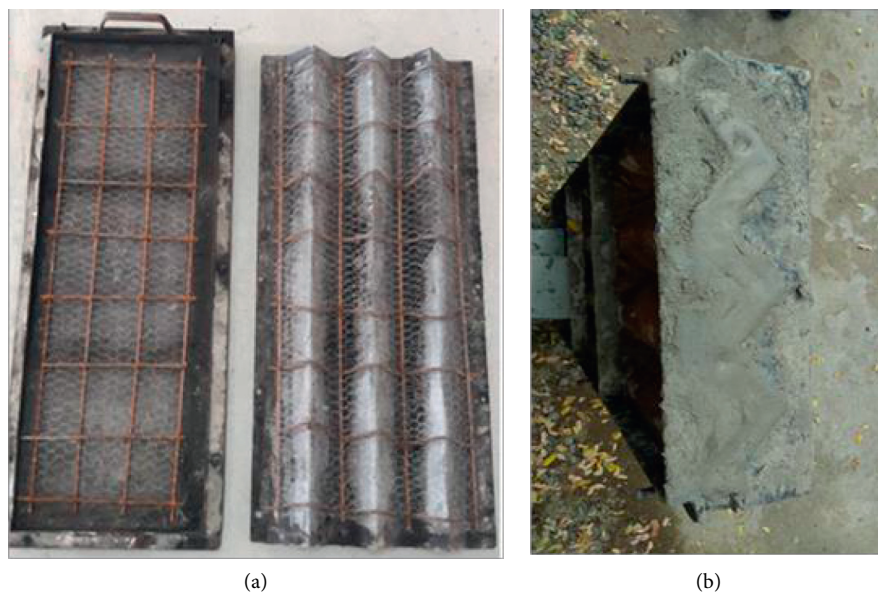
Fabrication and casting specimens. (a) Fabrication of reinforcement. (b) Casting specimens.
